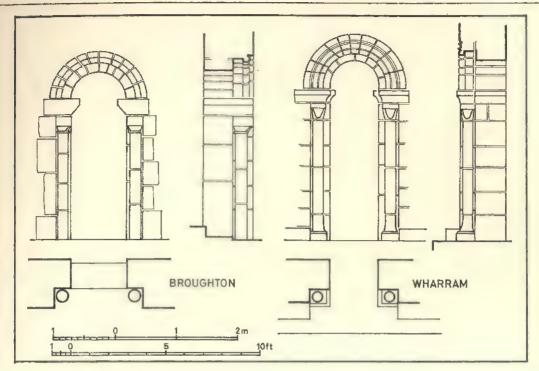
MOULDED AND RECESSED DOOR-HEADS
